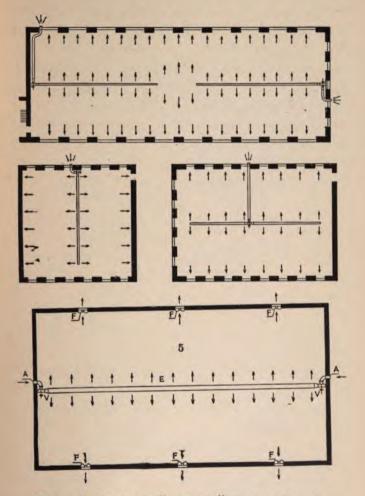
TYPICAL "KESTNER" INSTALLATIONS.
